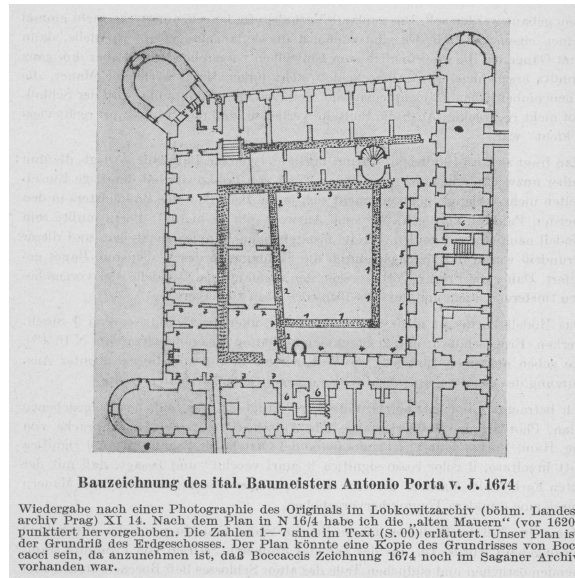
Floor plan of the ground floor of the palace in Żagań from 1674 [1]
